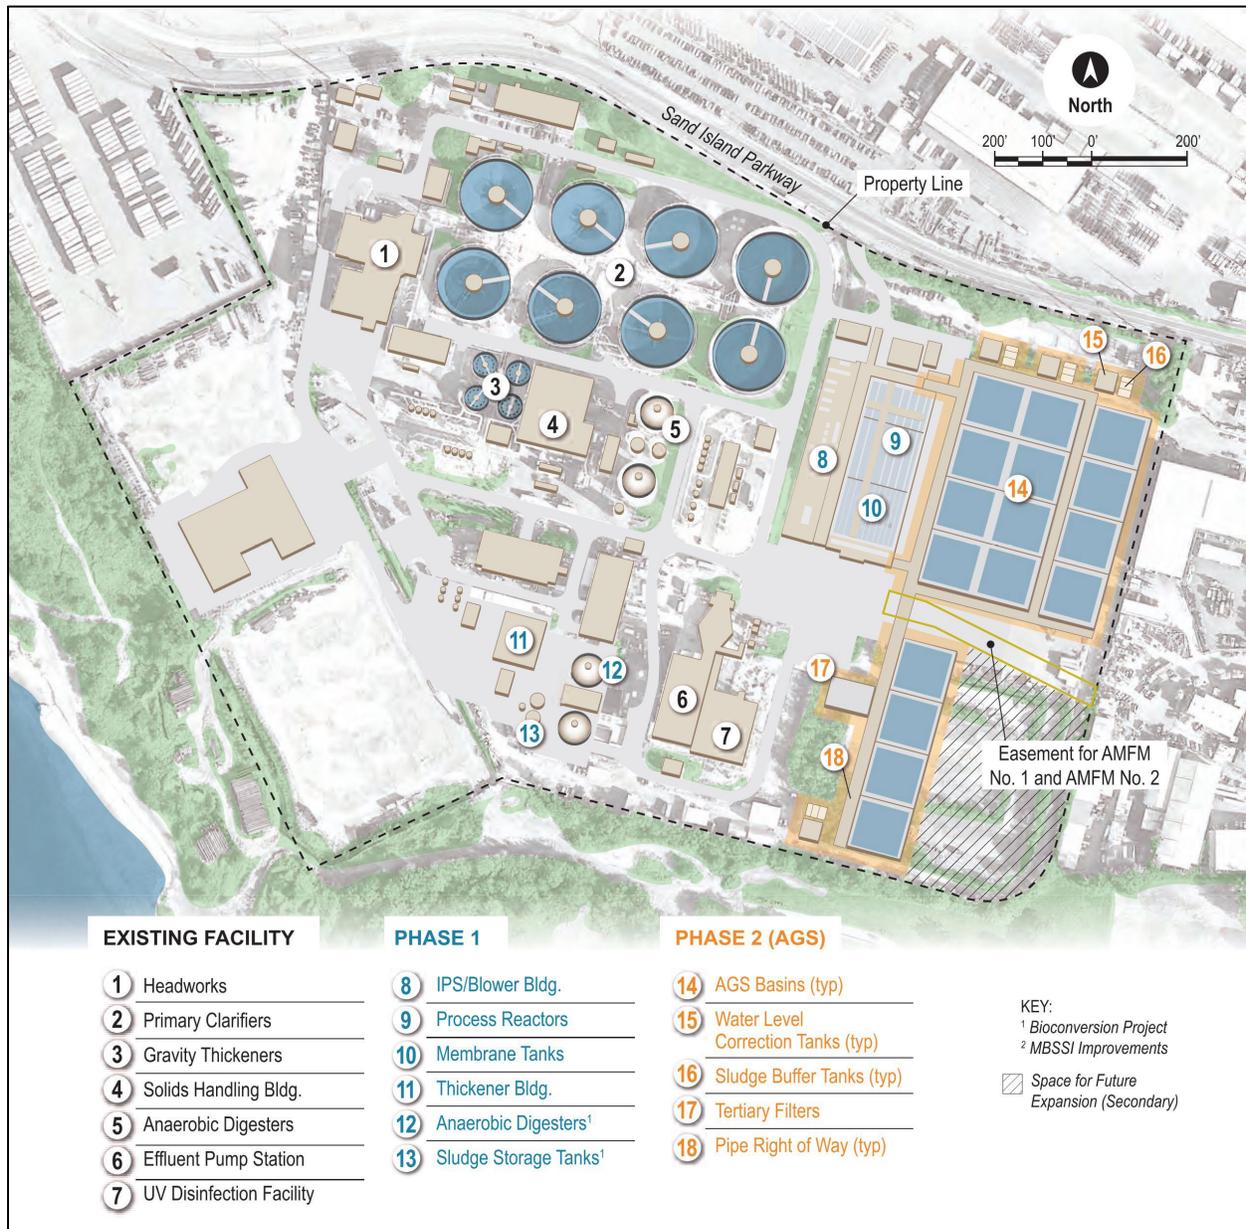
Preliminary Conceptual Site Layout for AGS Alternative
